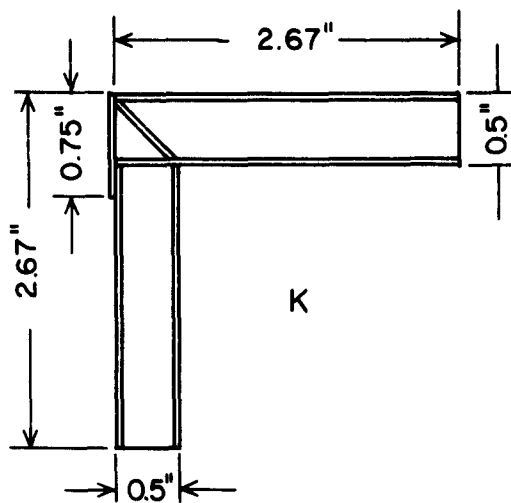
DIMENSIONS OF THE MODEL JOINTS TESTED
